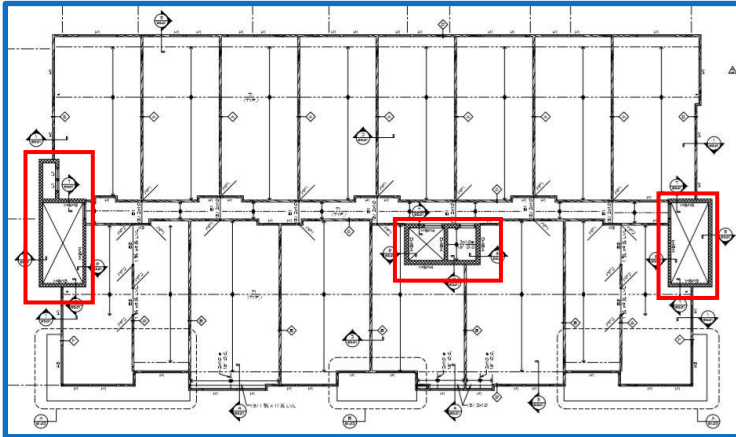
Apartment Level Floor Plan, Masonry Shaft Callout (KSS)
